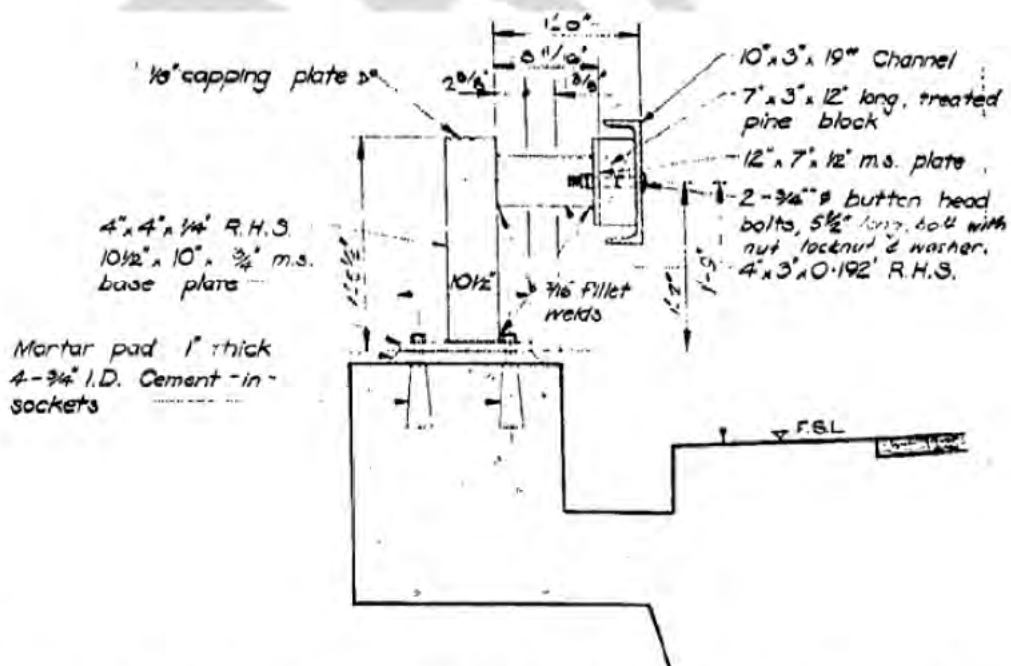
Bowen Street Overpass - Barrier Detail from Construction Drawings (Designed in 1971)
